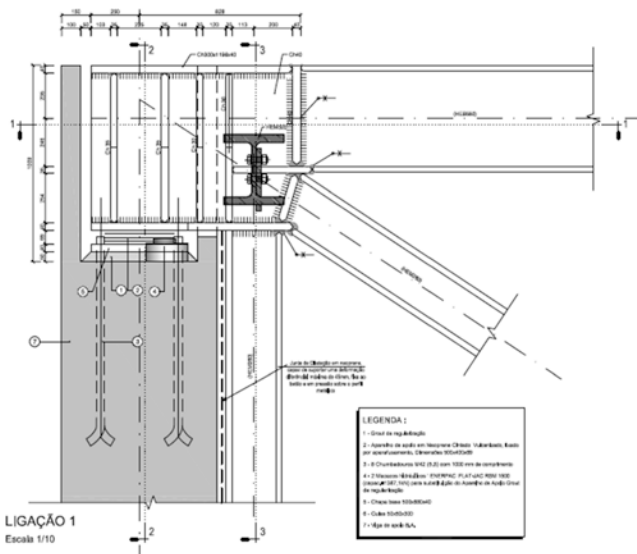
Detail of the connection of the steel structure with the concrete wall under construction
